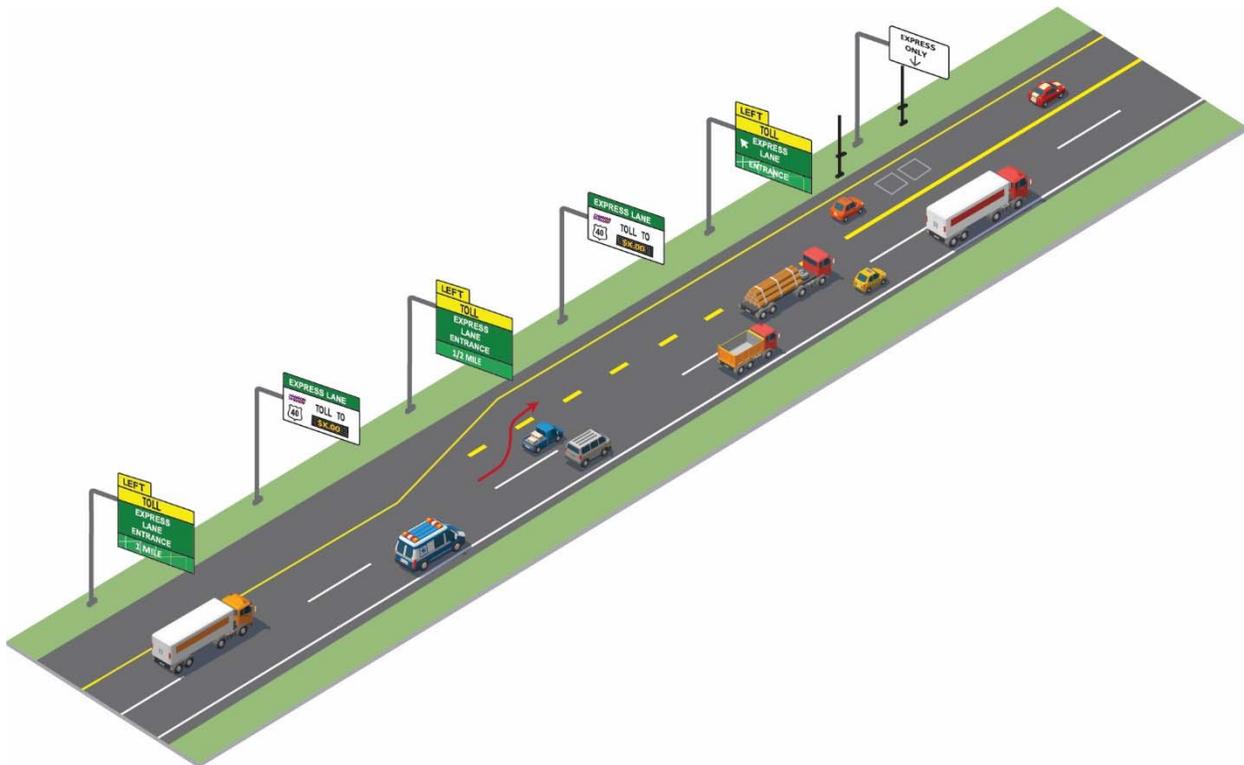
Conceptual Signing and Striping Plan for the Lane Entrance Zone
